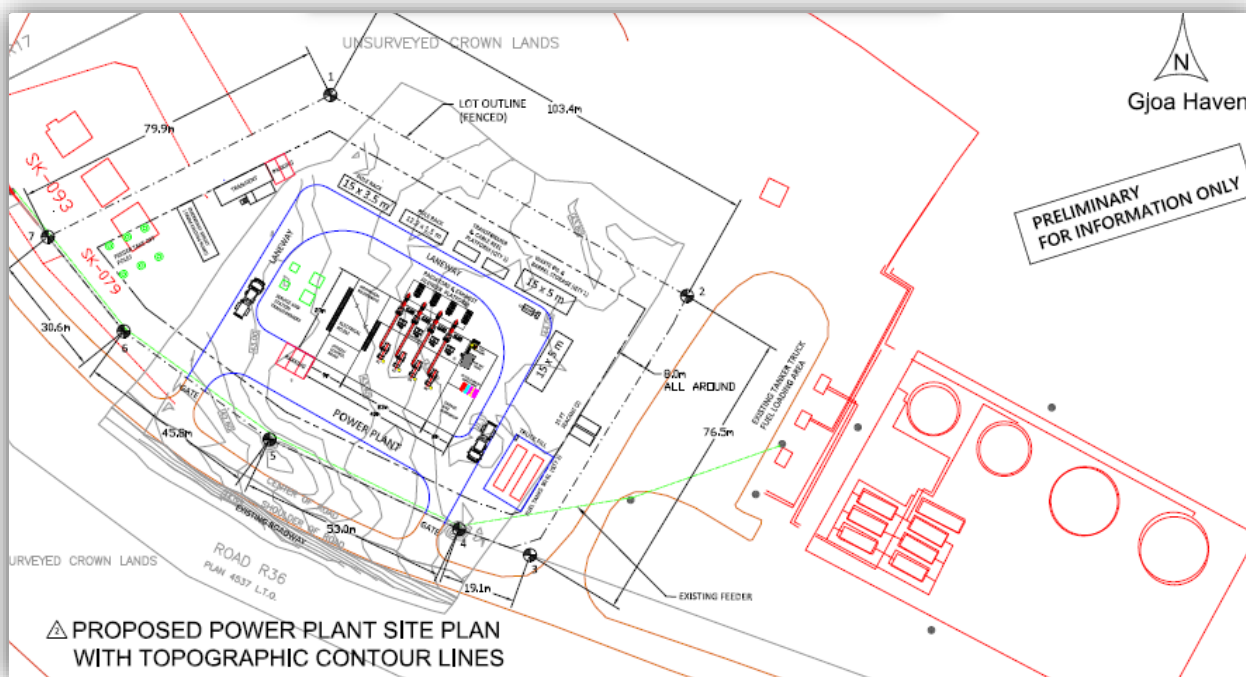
Site Plan depicting final orientation of the QEC Power Plant (GN-CGS, 2021)
